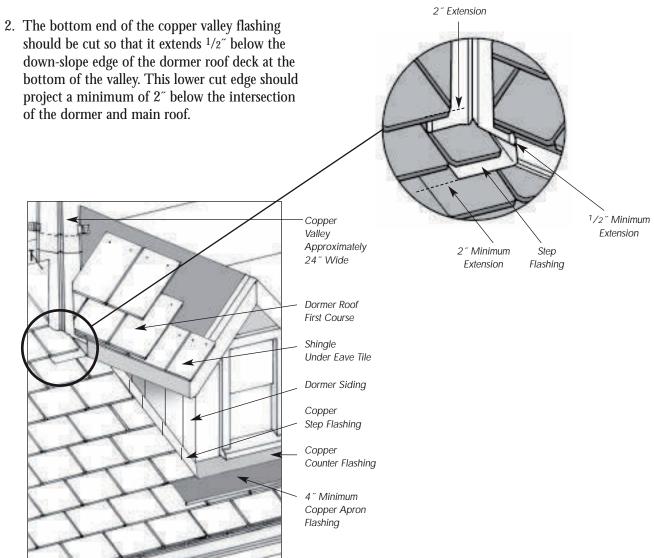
Open Valley at Main Roof to Dormer Juncture with Flat Shingle Tile
